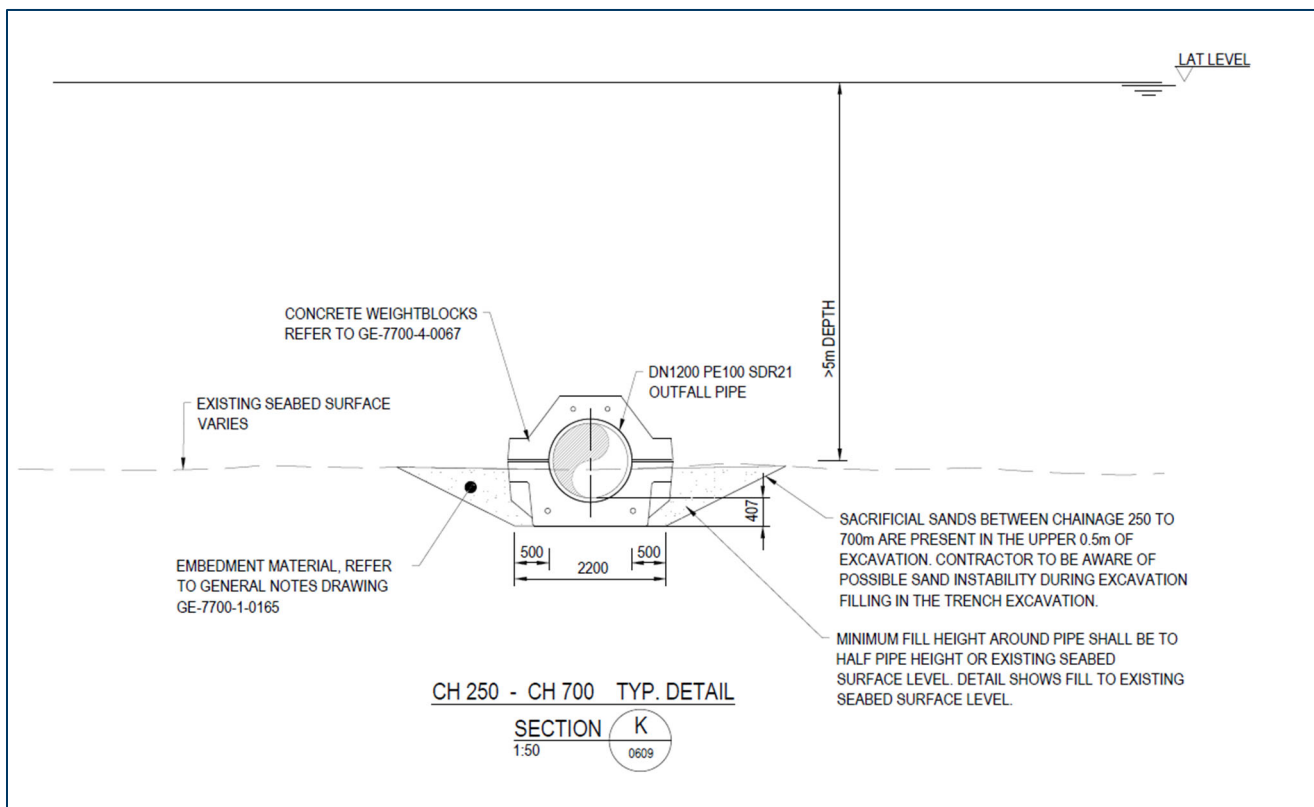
Typical cross section of pipe configuration in waters deeper than 5 m LAT
